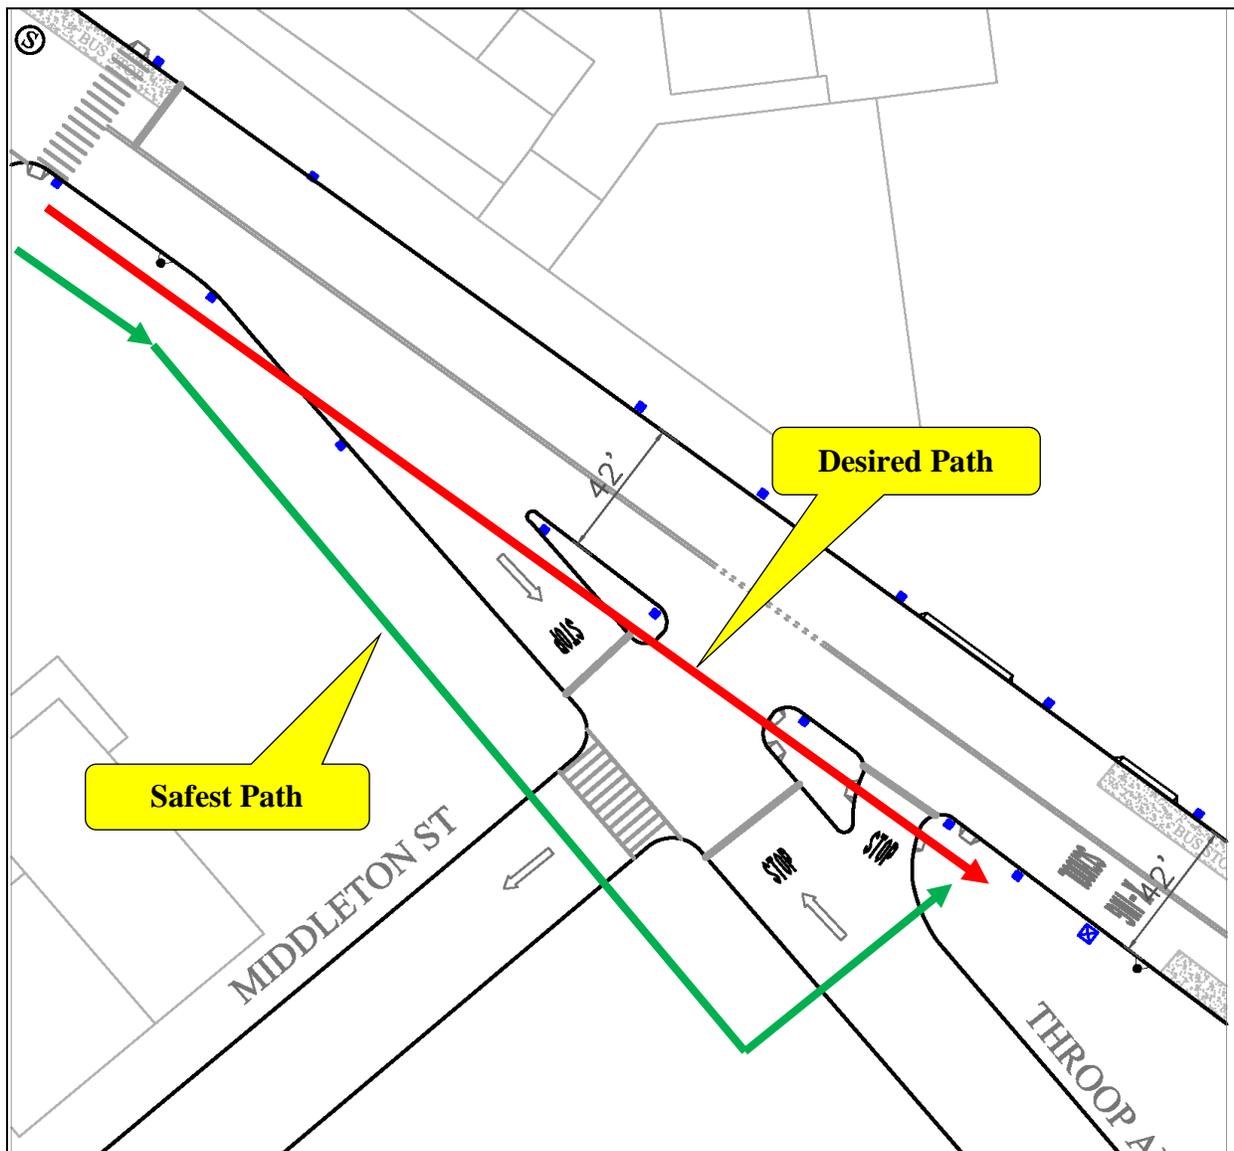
Broadway, Middleton Street and Throop Avenue Existing Conditions
